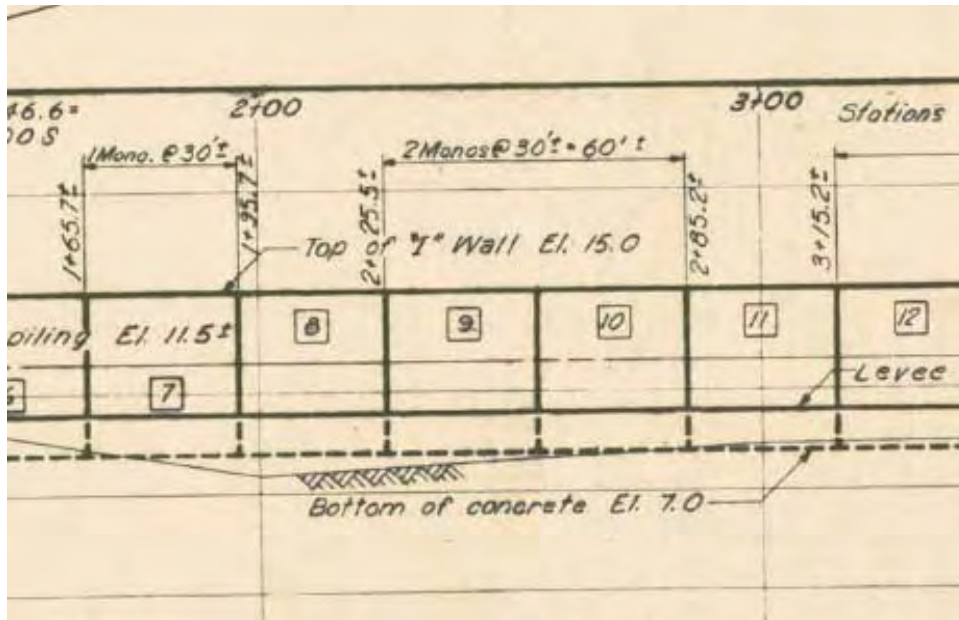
East Side I-Wall Design Elevation 15.0 ft (Sta. 2+00 Typical)
